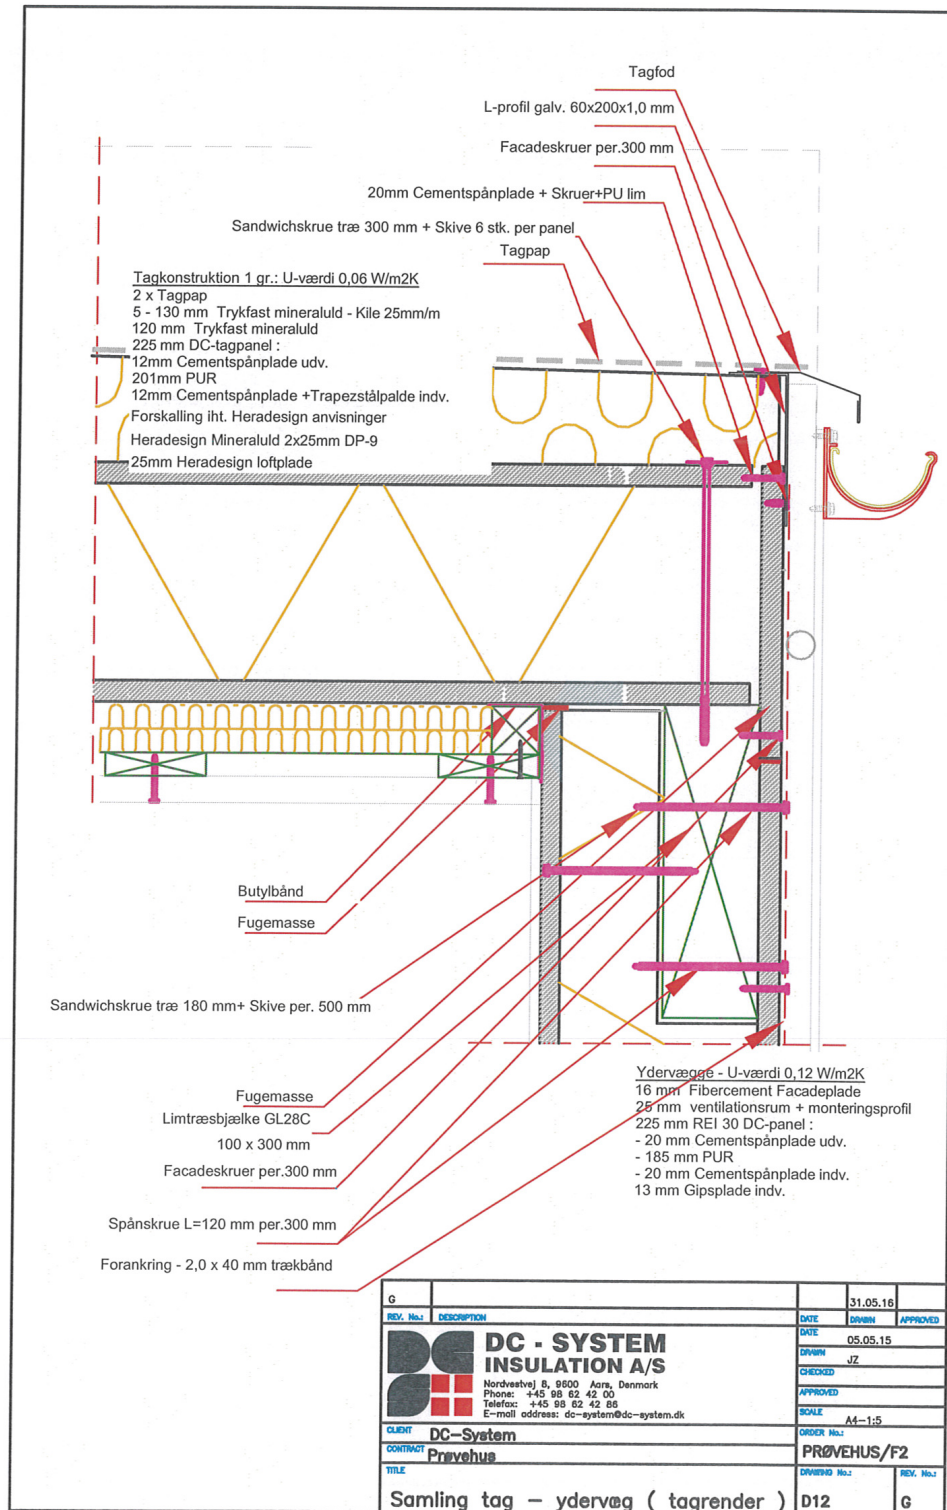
Detail: Wall-roof (beam). [DC-System, Test House (2015)]
